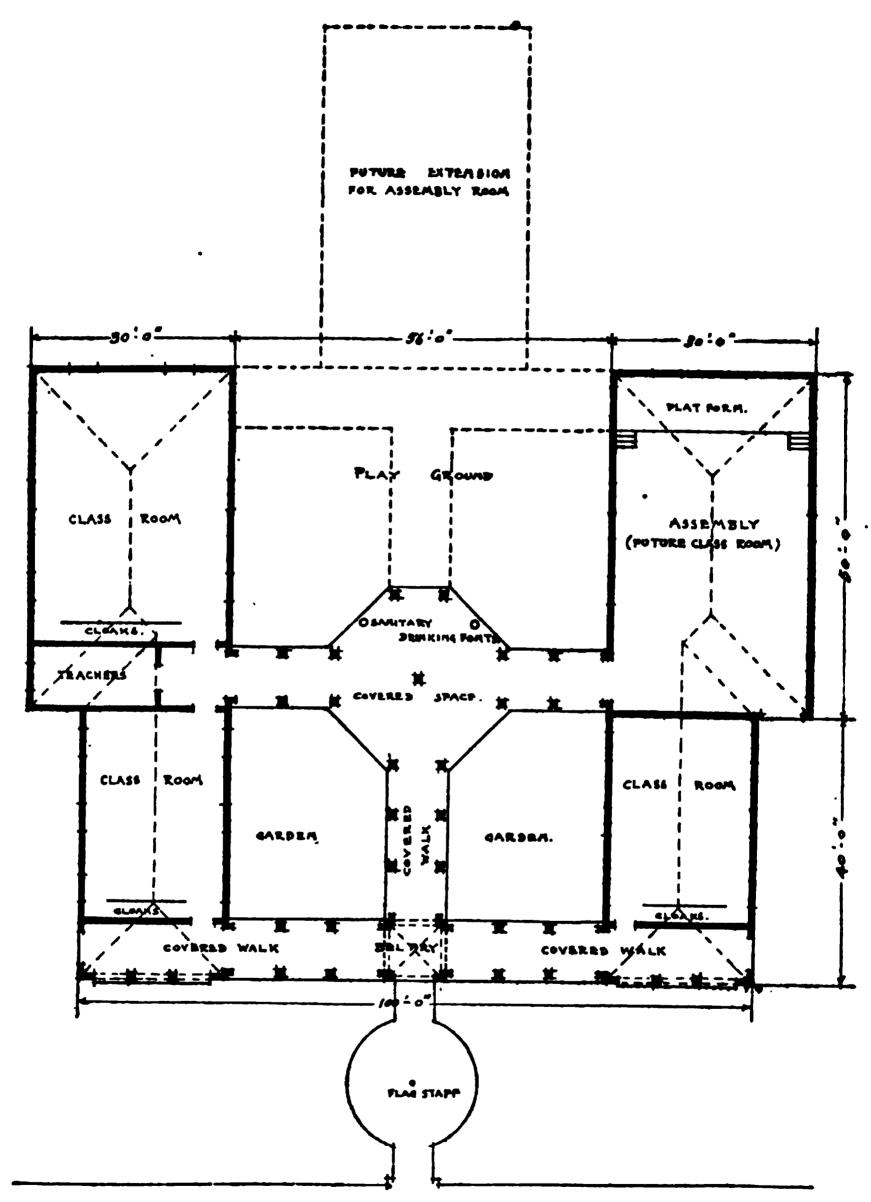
Floor plan, school at Cocoanut Grove, Fla.
